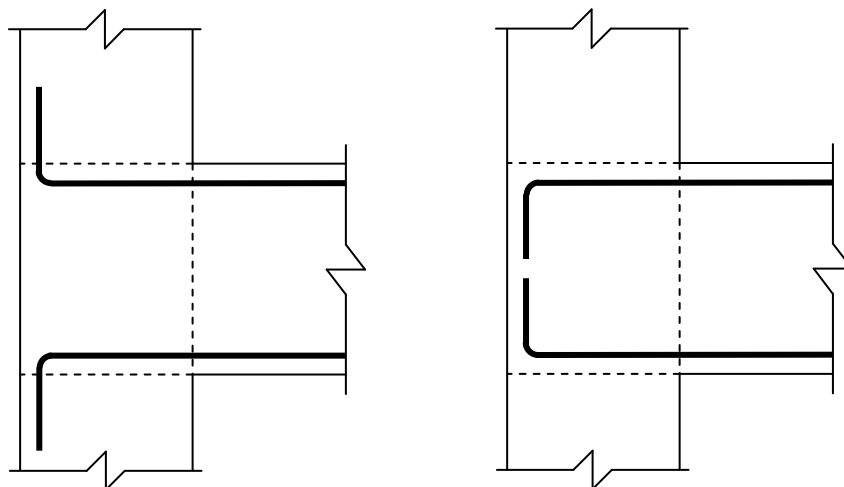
Exterior joints with (a) beam bars bent out (b) beam bars bent in
